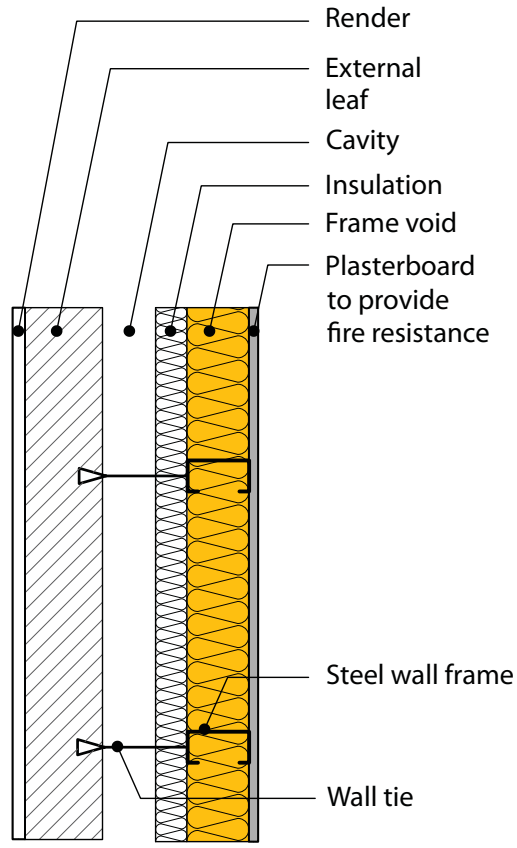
Warm light steel with full fill insulation in frame void (plan view)
